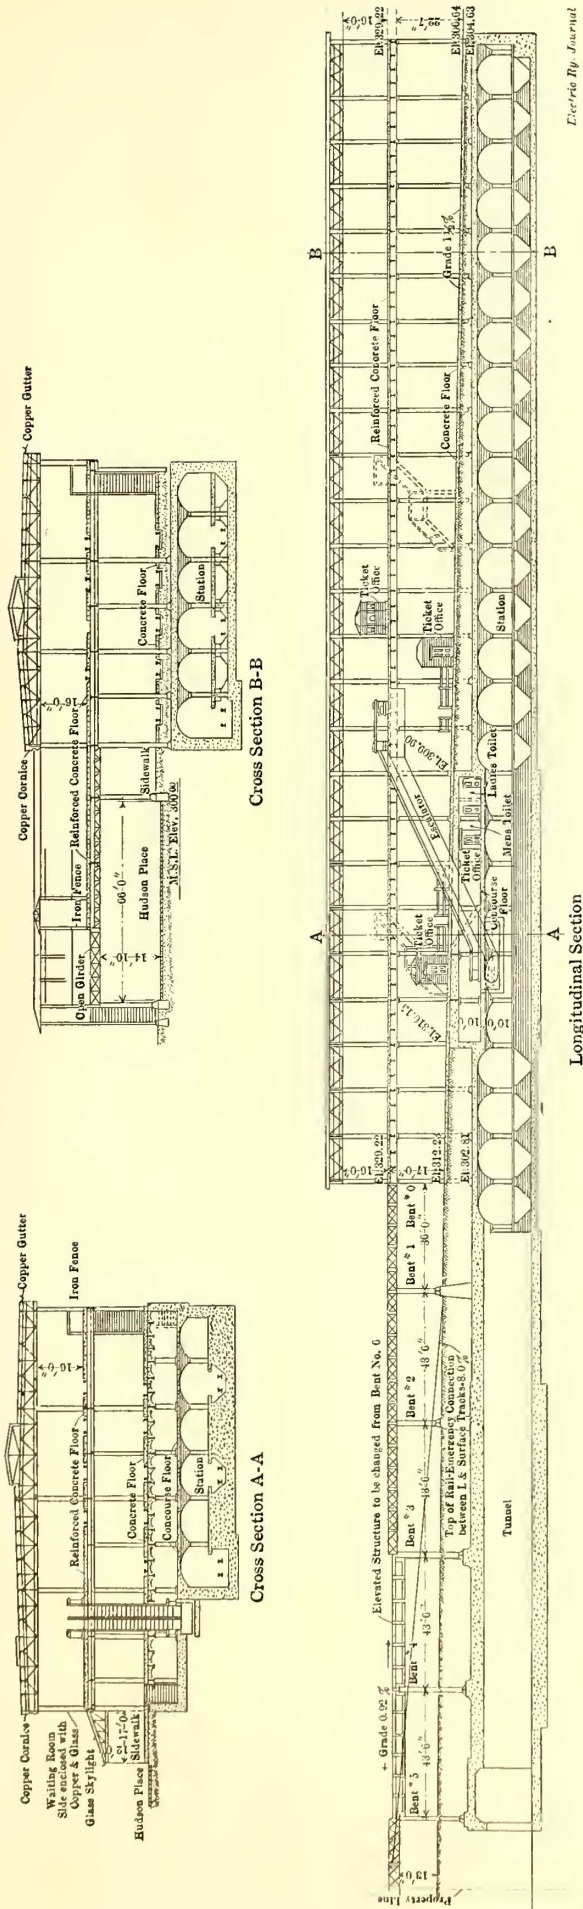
Hoboken Terminal—Cross and Longitudinal Sections of Terminal Building
